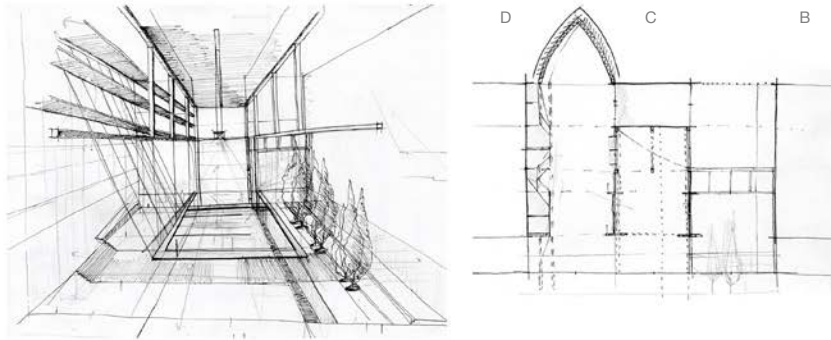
Inclusion of light shelves, roof structure supported by vierendeel trusses to control light entering the space, and the addition of a suspended walkway (Author 2016)
